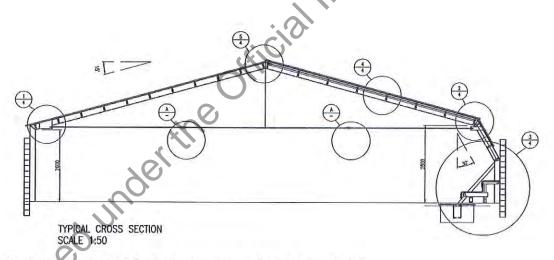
Typical cross section following improvement works undertaken in 1999
